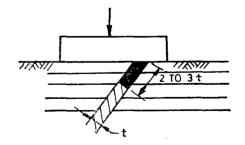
WEAK SEAMS UNDER FOUNDATION LESS
